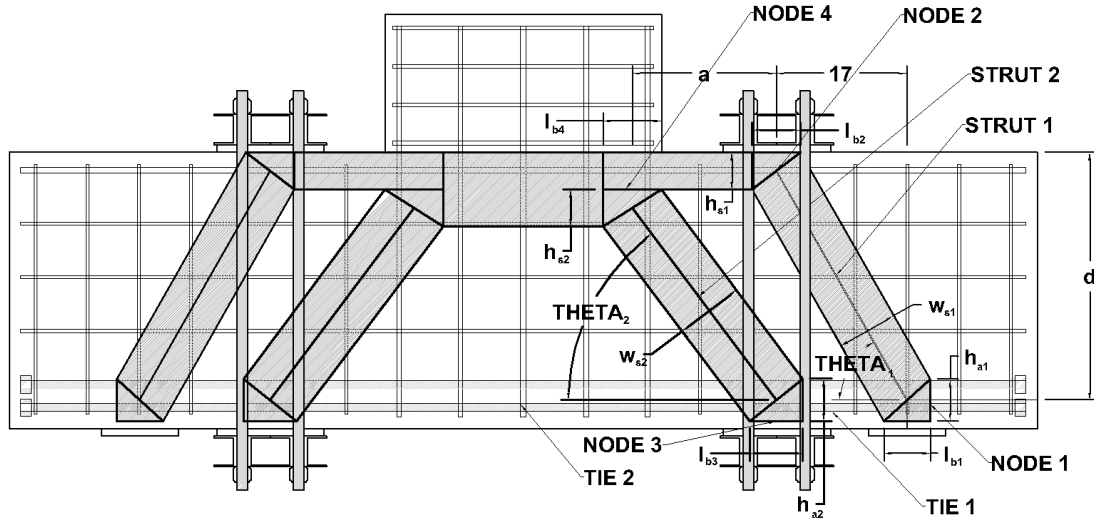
Post-tensioned pier cap specimen strut and tie mechanism
